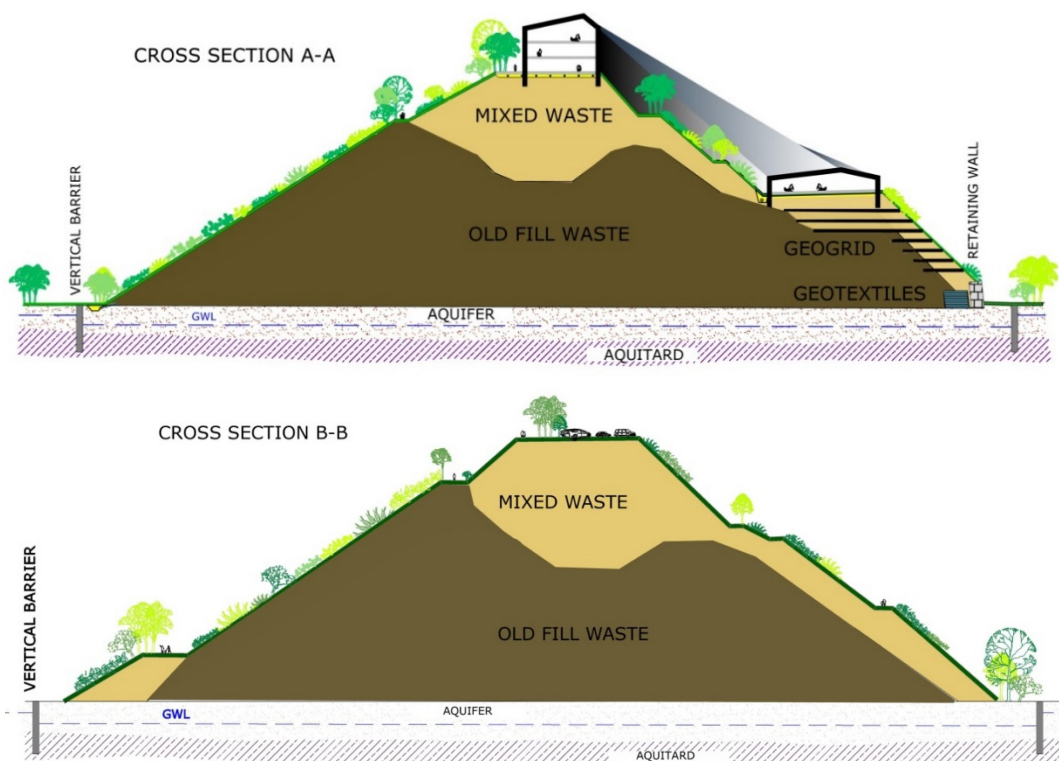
Cross-sections AA and BB (located in Figure 3), presenting the engineered slope geometry and reinforcement solutions.
